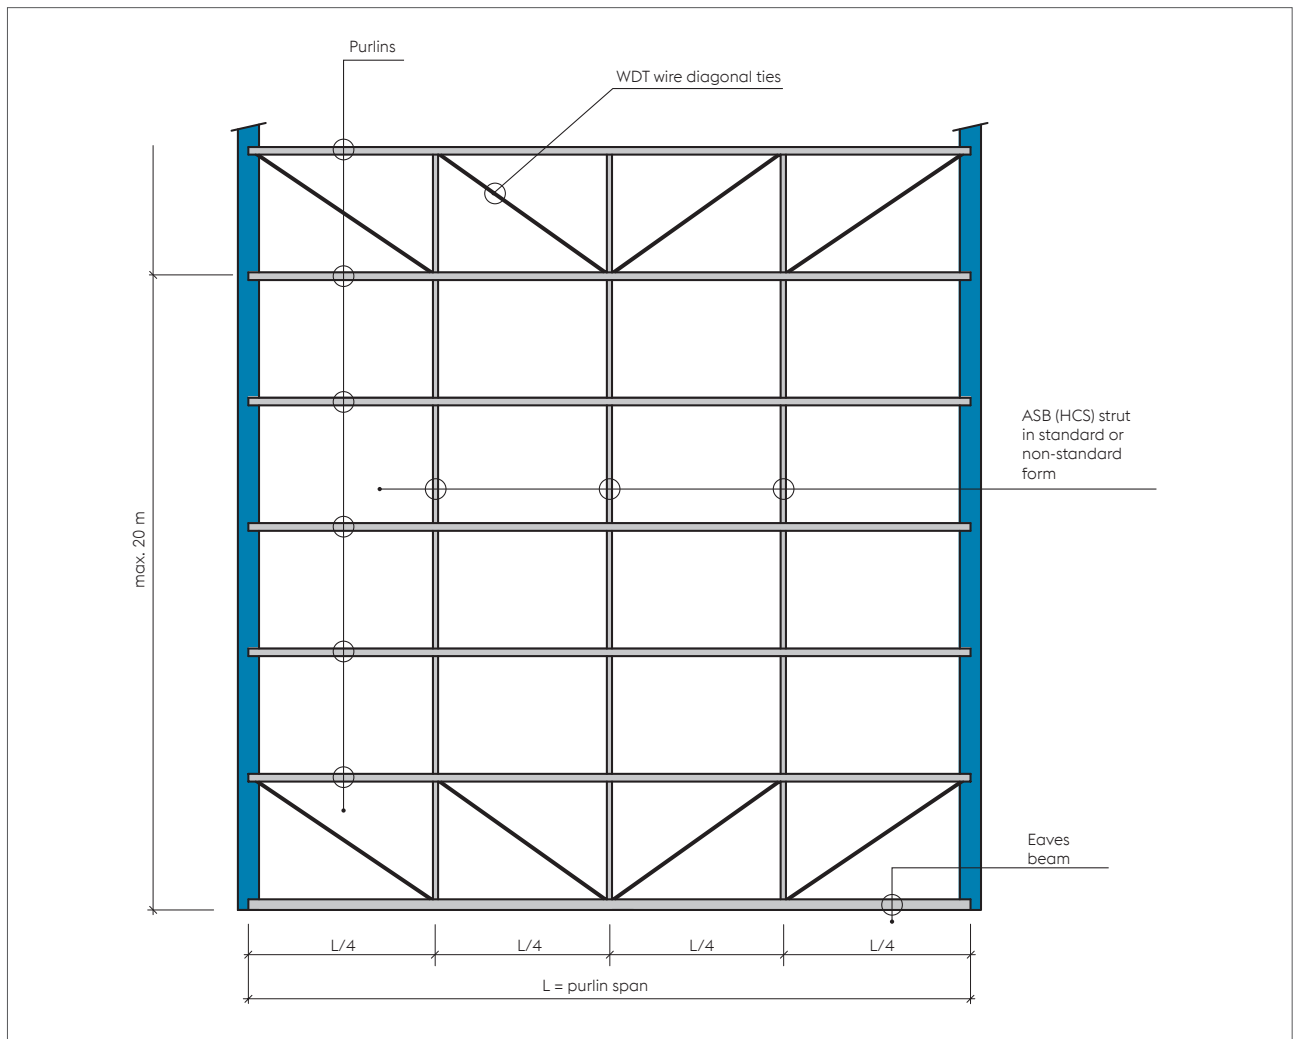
Bracing of purlins in double- or single-pitch roofs featuring three rows of struts
